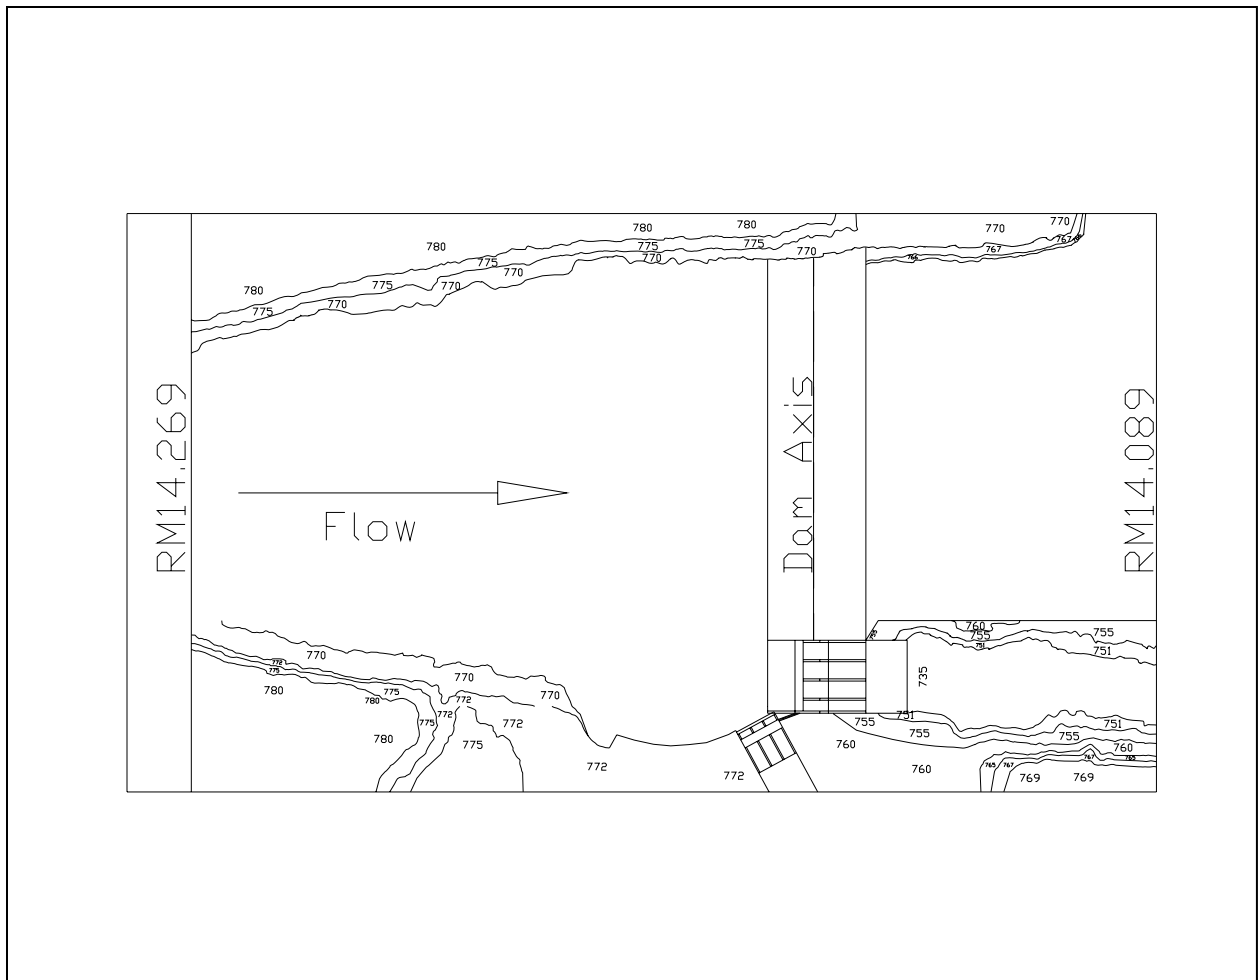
Plan view of model and section showing model upstream boundary weir.
